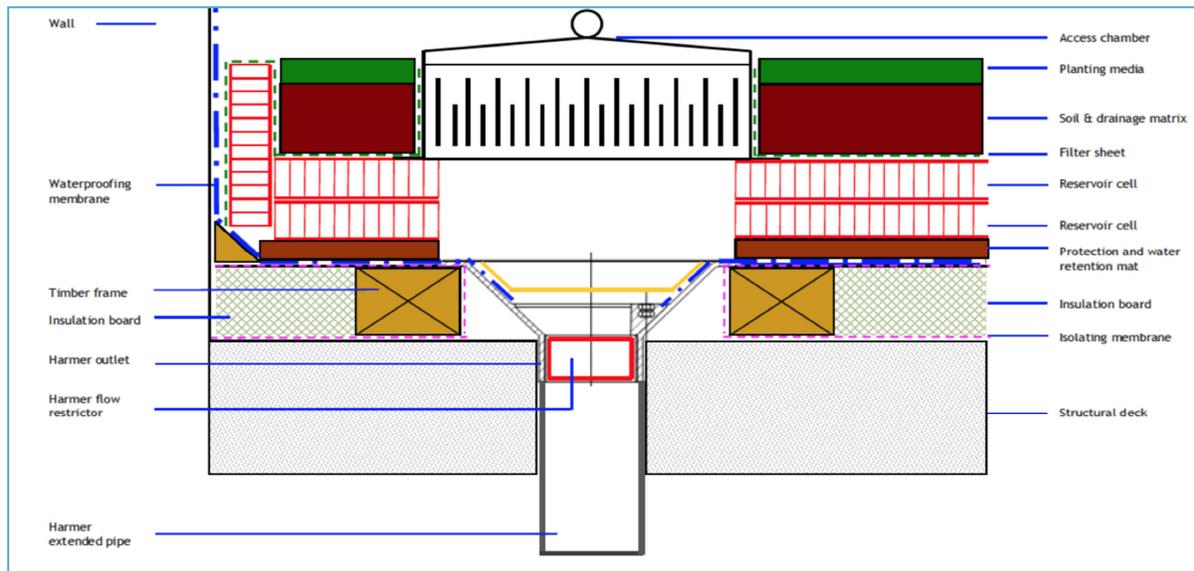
Alumas typical roof schematic and detail of rainwater outlet. Source: Alumas
